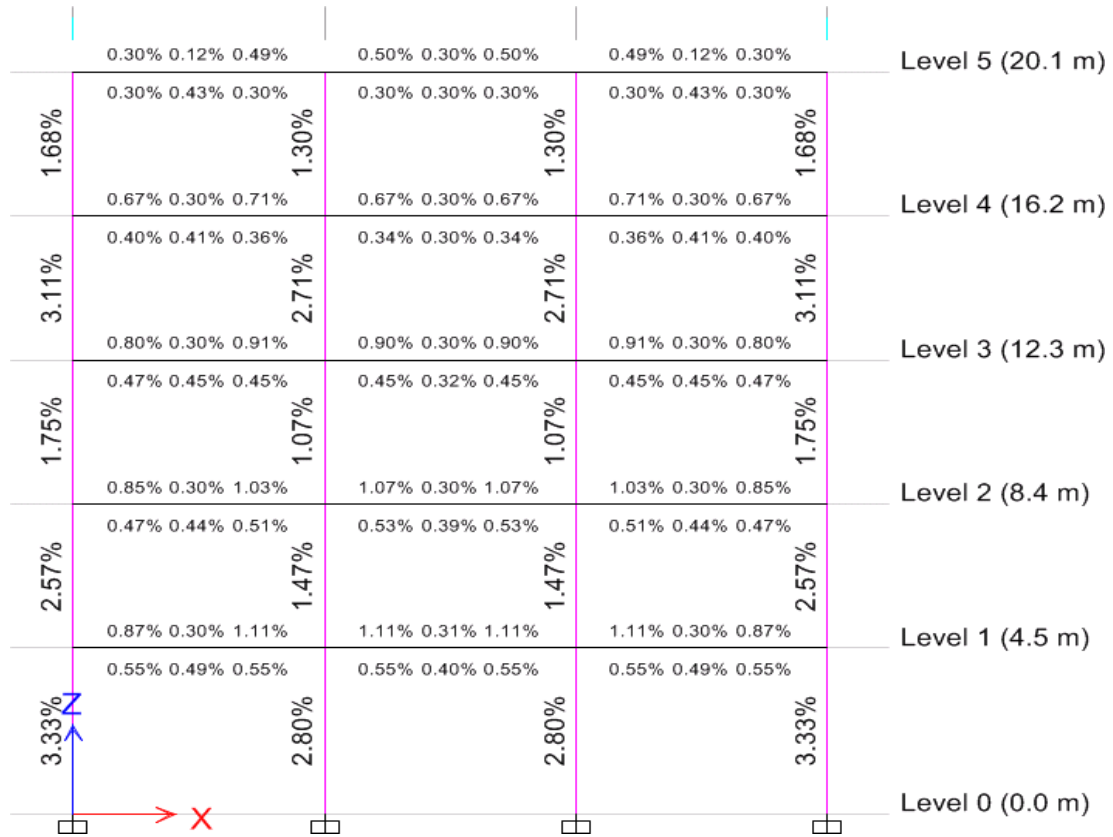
Required longitudinal reinforcement for building ID 2441
